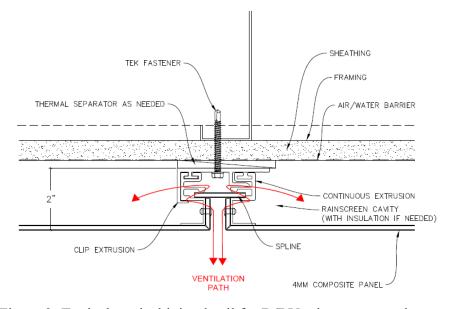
Typical vertical joint detail for D/BV rainscreen panel system
